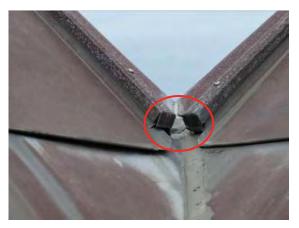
Depicts close view of aged, degraded, and failing sealant at the roof panel intersection above the north courtyard.
